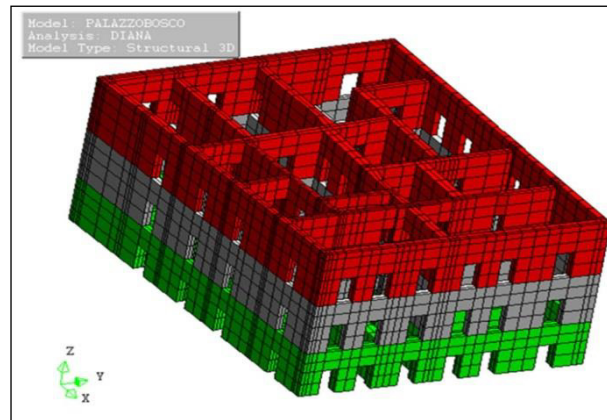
3D FE Model of Palazzo dell'Aquila Bosco Lucarelli (no modeling of the underground floor)
